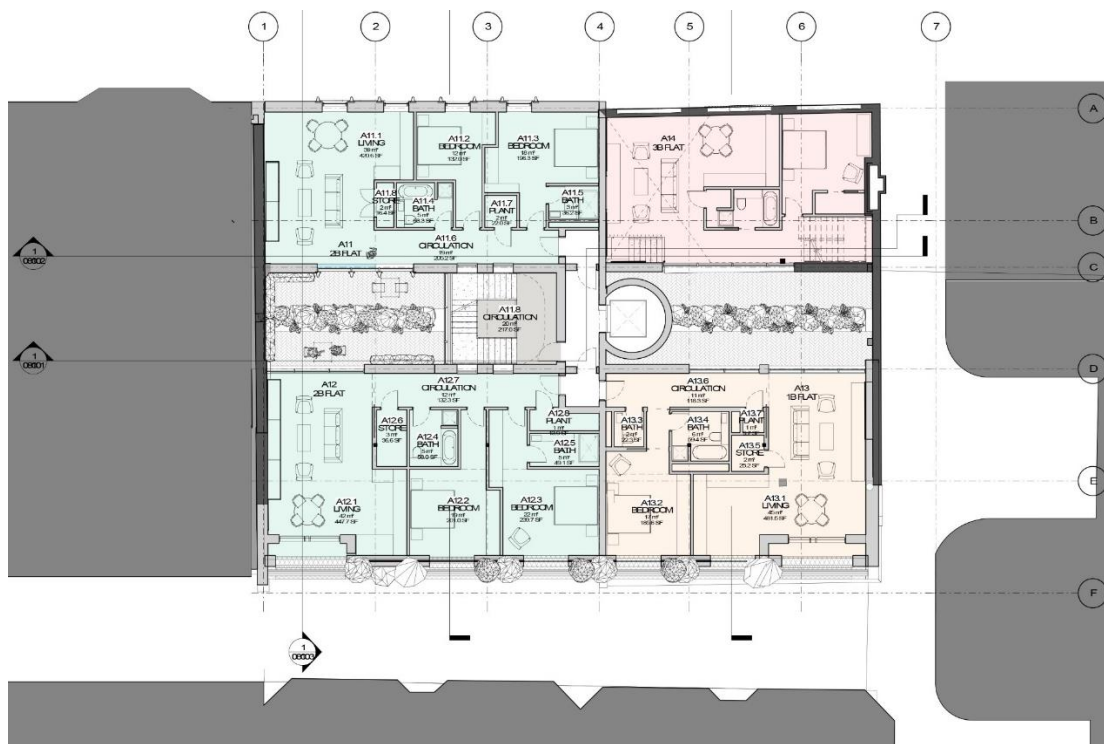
Baseline Option [Min building retention + max on-site material reclaim/re-use] - Typical Floor Layout
